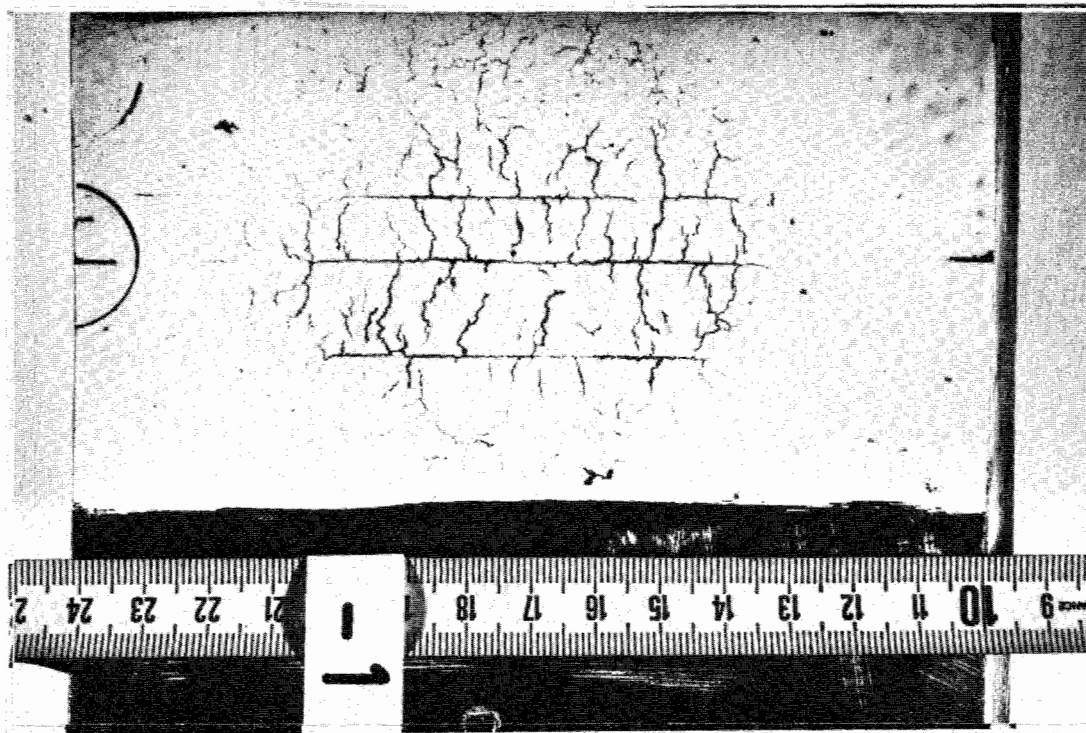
Specimen No. 1 : crack offset : - 1 mm
